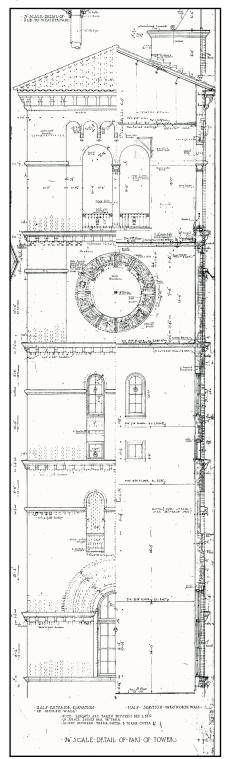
Fisher and Fisher drawing of Clock Tower (Source: SHAFI collections)
